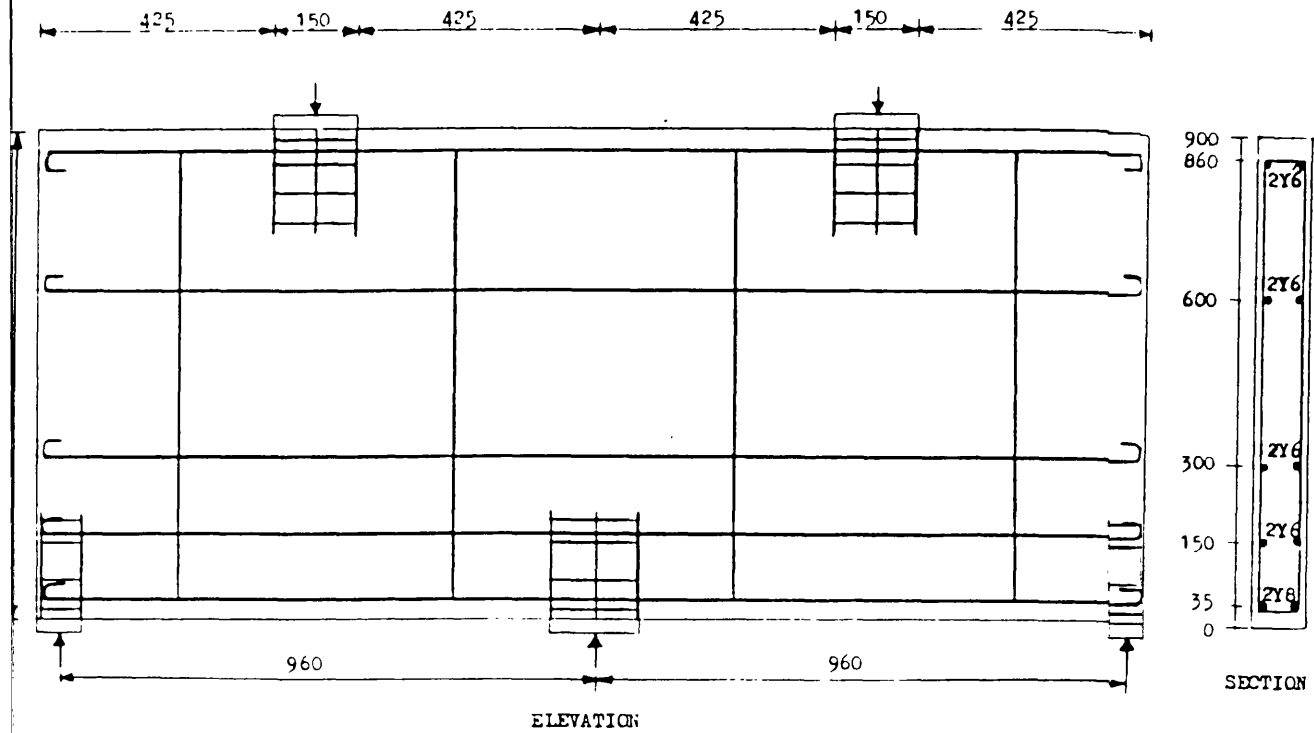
Dimensions and reinforcing details of girder TRGRAS2
